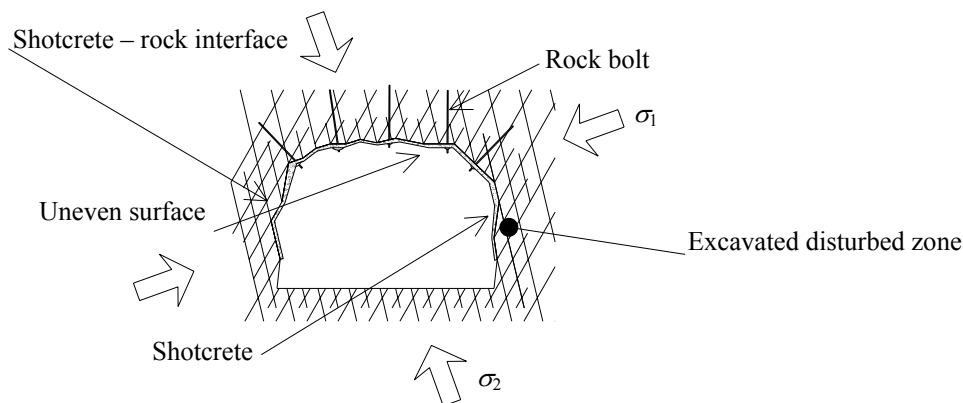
Shotcrete – rock interaction, tunnel section with irregular shape.
